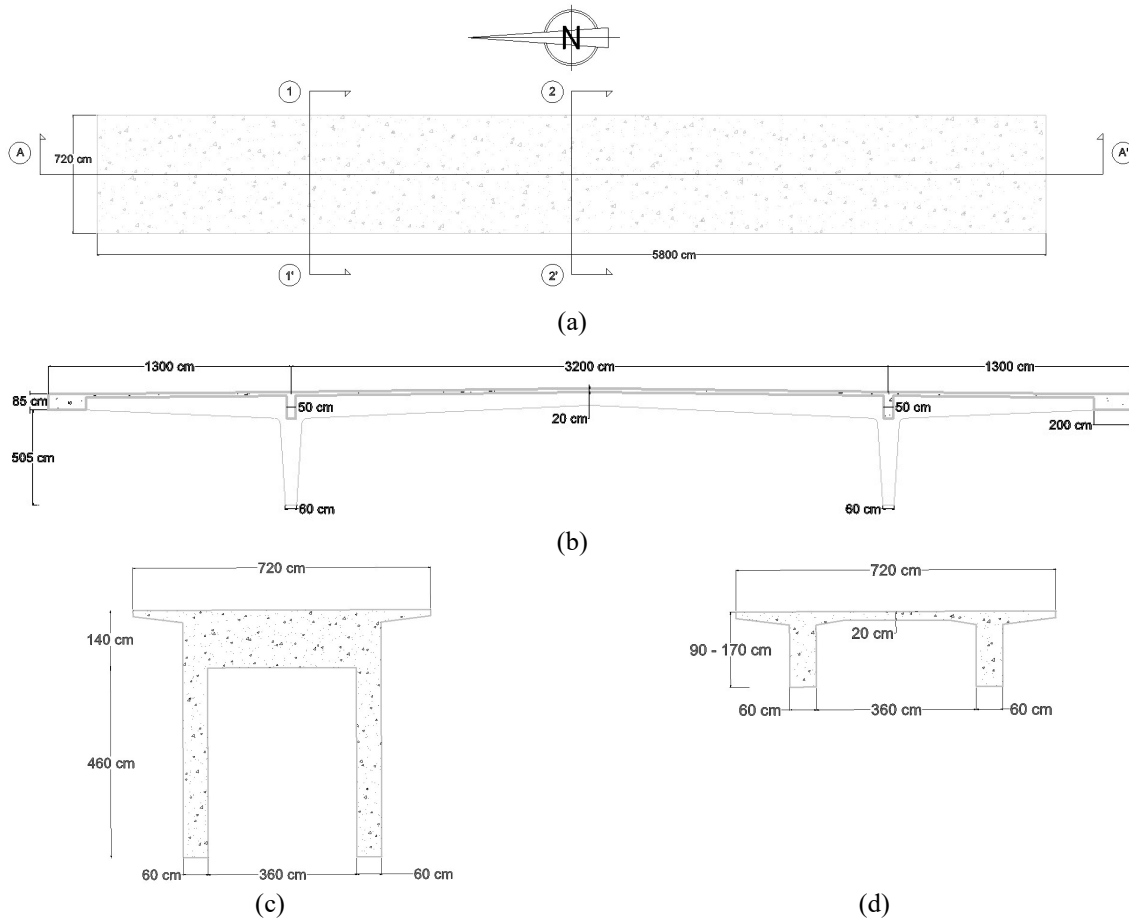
Bridge geometry: (a) Plan view, (b) Section A-A', (c) Section 1-1', (d) Section 2-2'.
